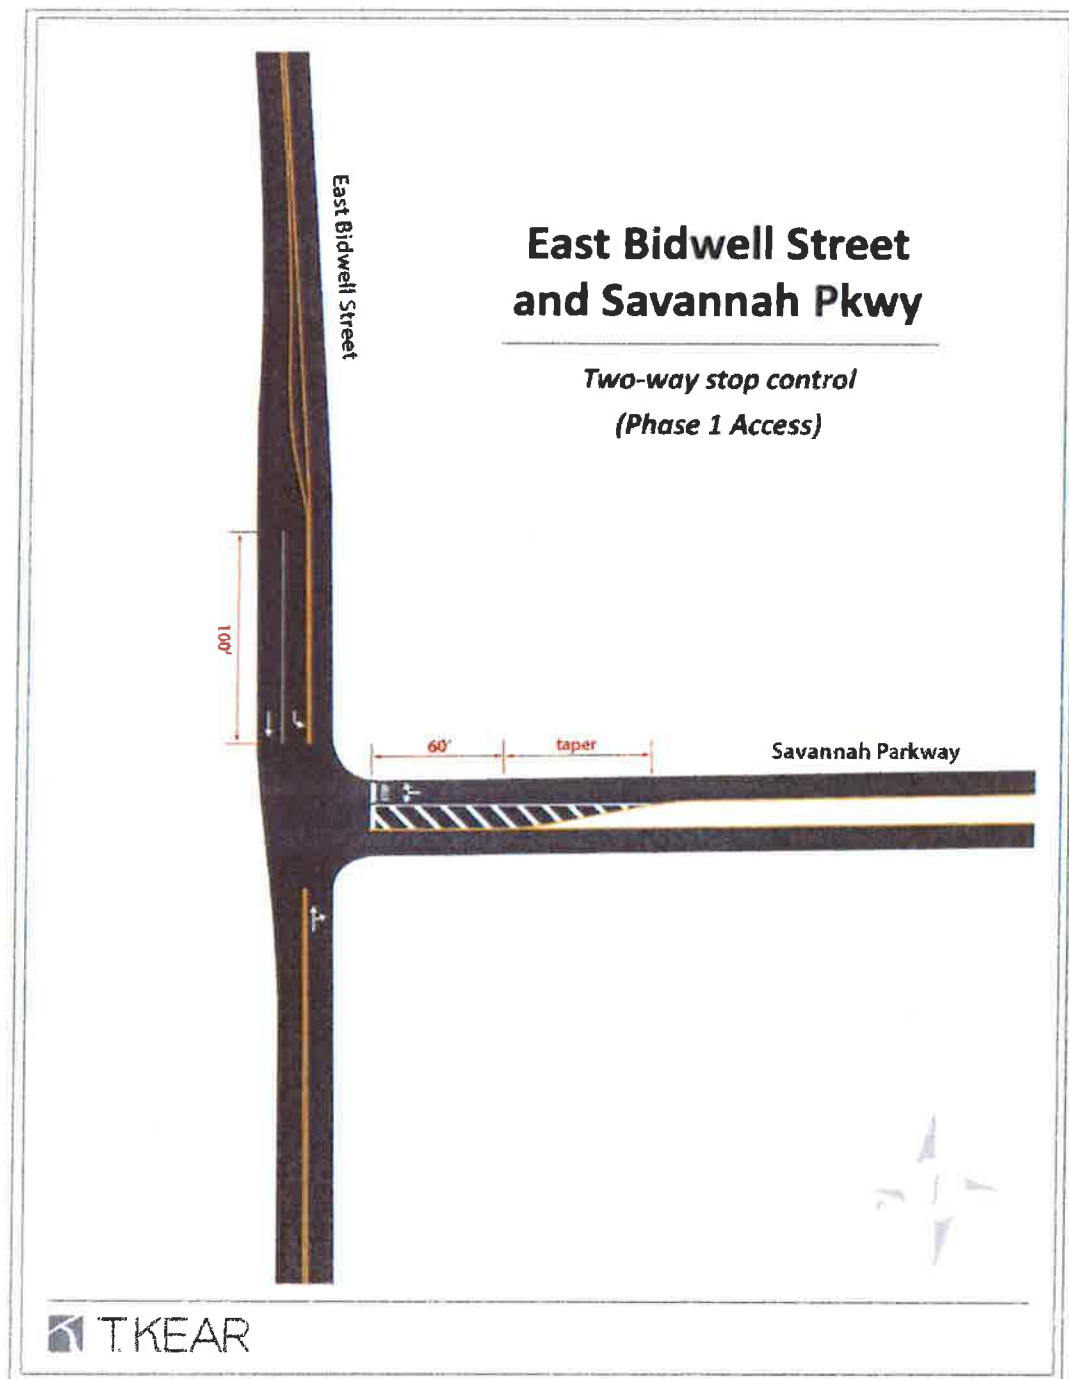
East Bidwell Street/Savannah Parkway TWSC
